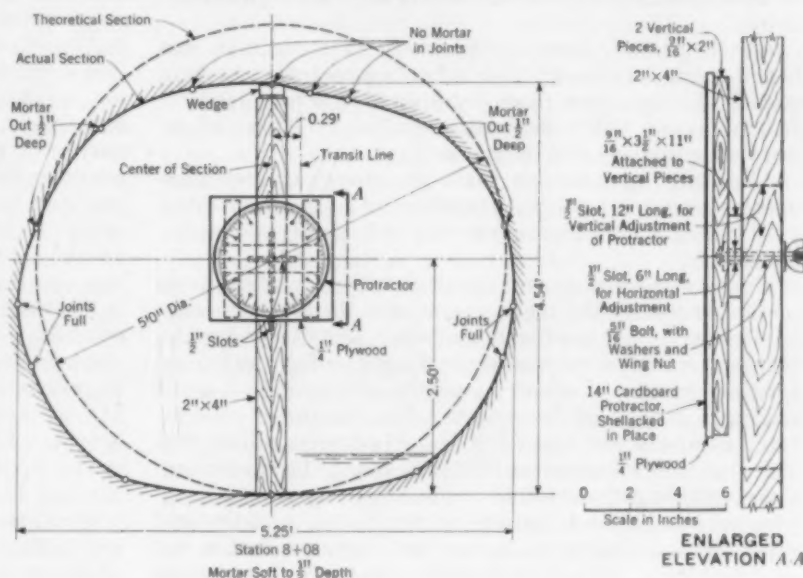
TYPICAL SECTION THROUGH BRICK SEWER
